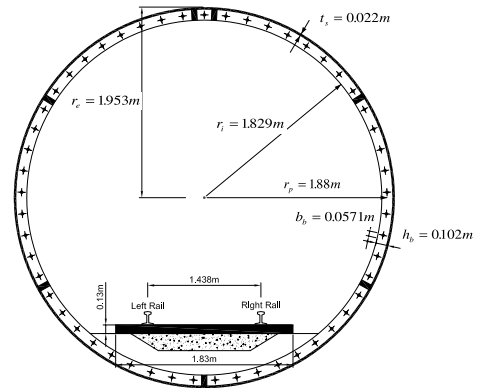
Cross section of the metro tunnel on the Bakerloo line at Regent's Park.
